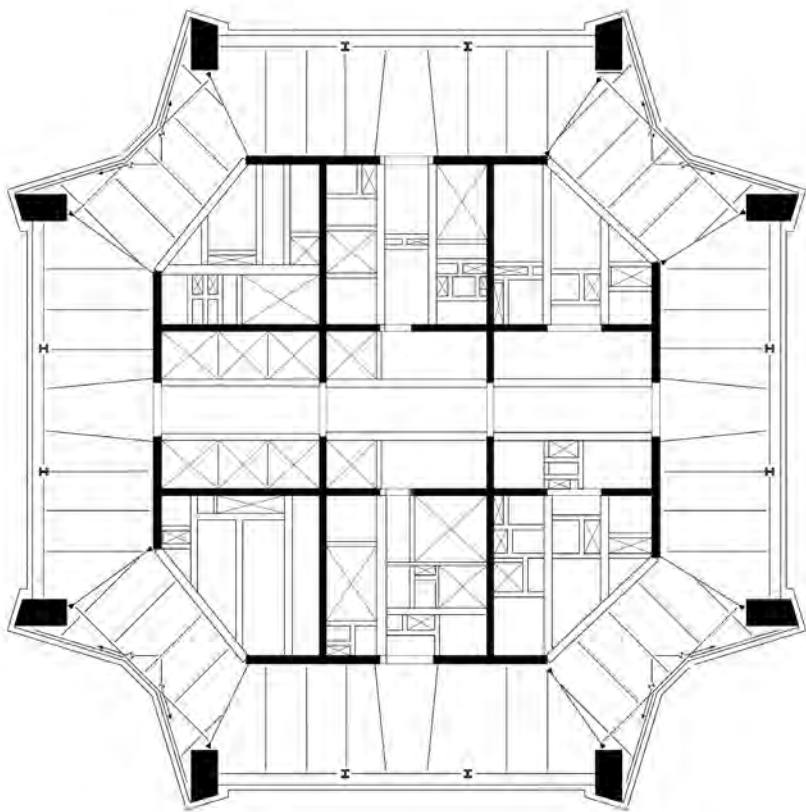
Typical high zone floor plan showing pinched corners. (Source: KPF)
